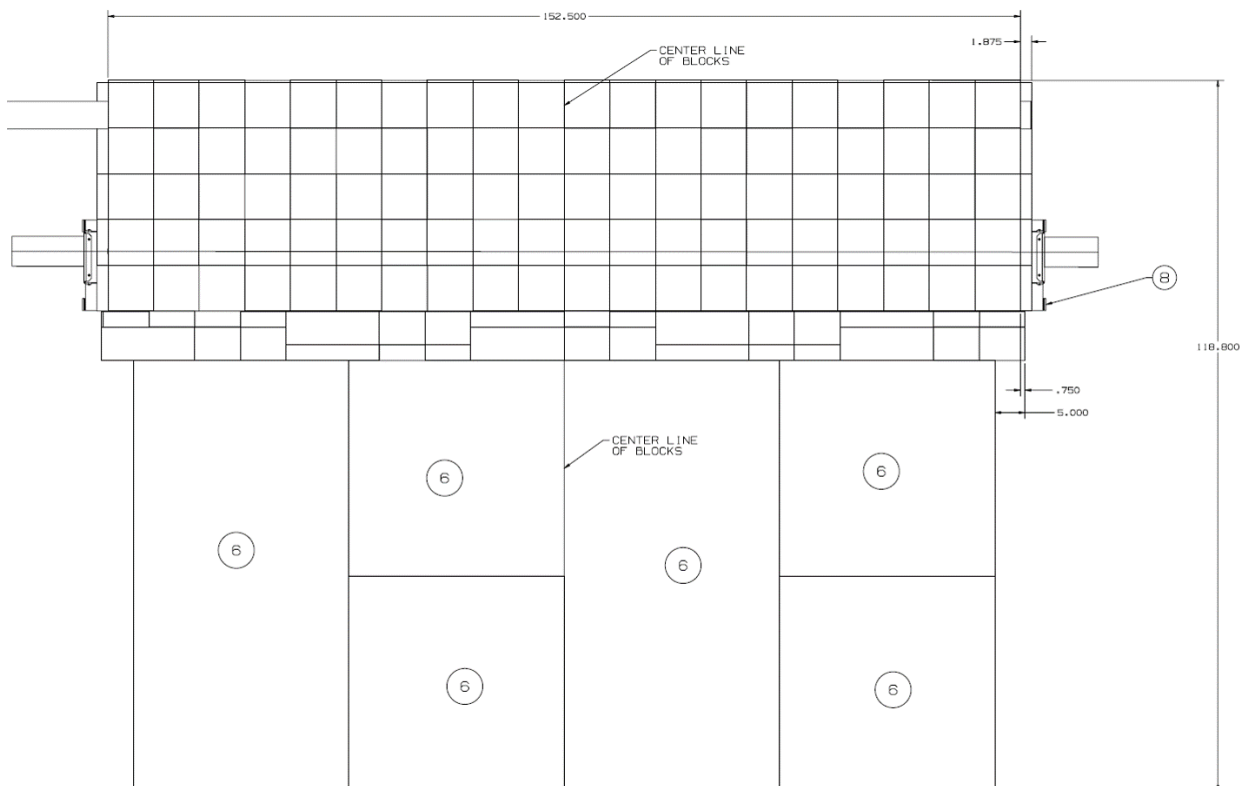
Stacking plan view of the M5 shield wall provided from Reference 15. The hand stacked block density is modeled at 2.13 g/cc while the larger concrete blocks are modeled with a density of 2.35 g/cc.
